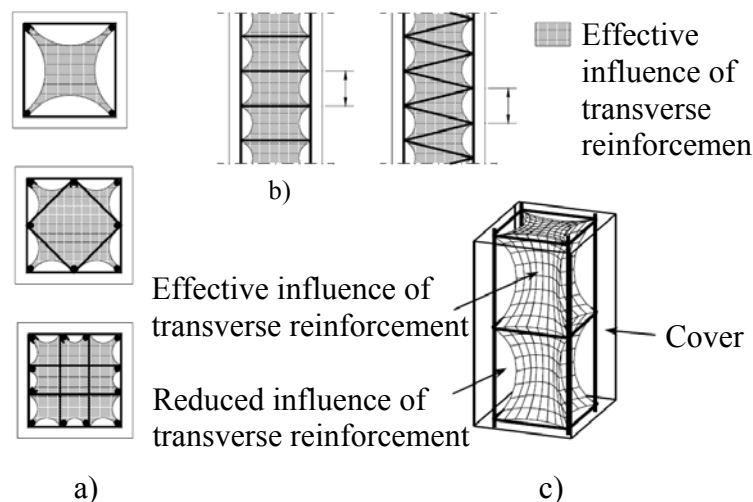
Effective influence of transverse reinforcement of reinforced columns; a) squared and b) circular cross-section; c) 3D view on a column of squared cross-section
